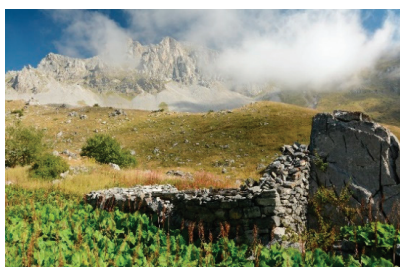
Existing boulder as the part of sidewall—Carine, katun of Popovići, photo: I. Laković.
